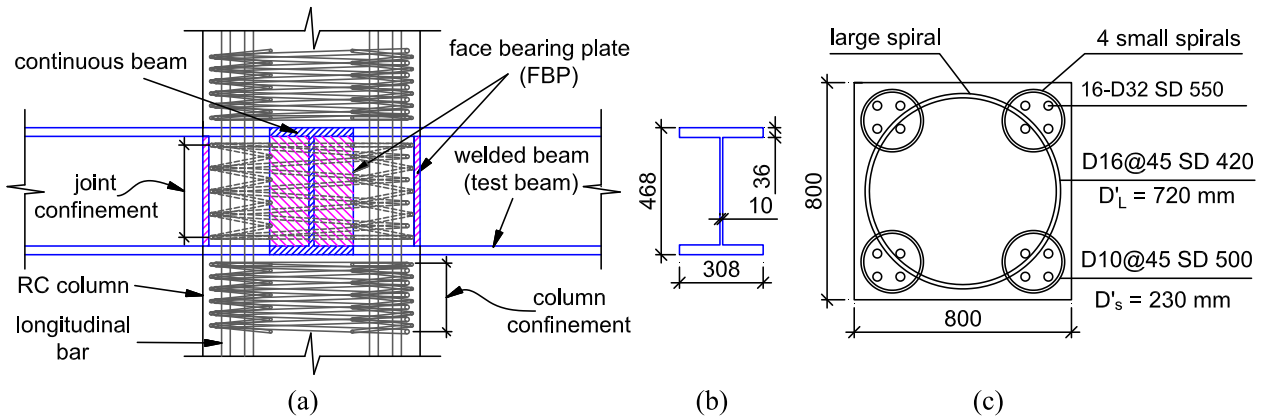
Design details of column and beam of specimens: (a) elevation view of beam and column, (b) beam section, and (c) column section (Unit: mm).
